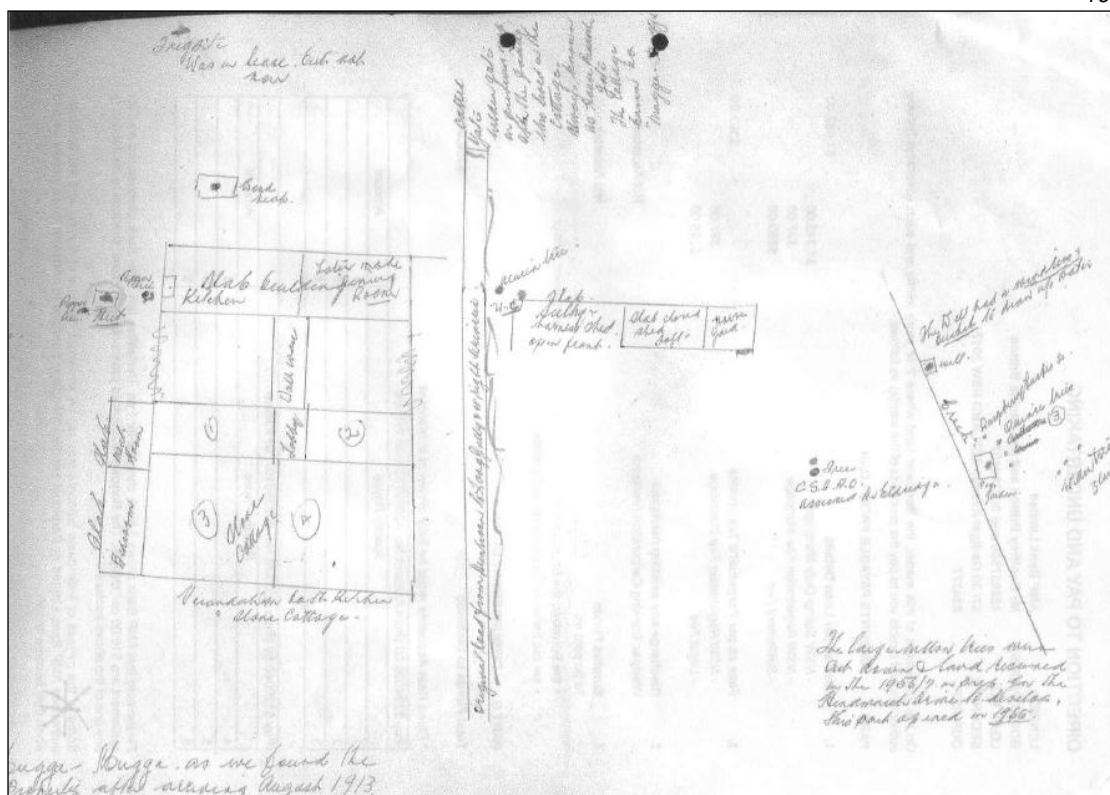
August 1913 'Conjectural Reconstruction' Plan drawn by Sylvia Curley
